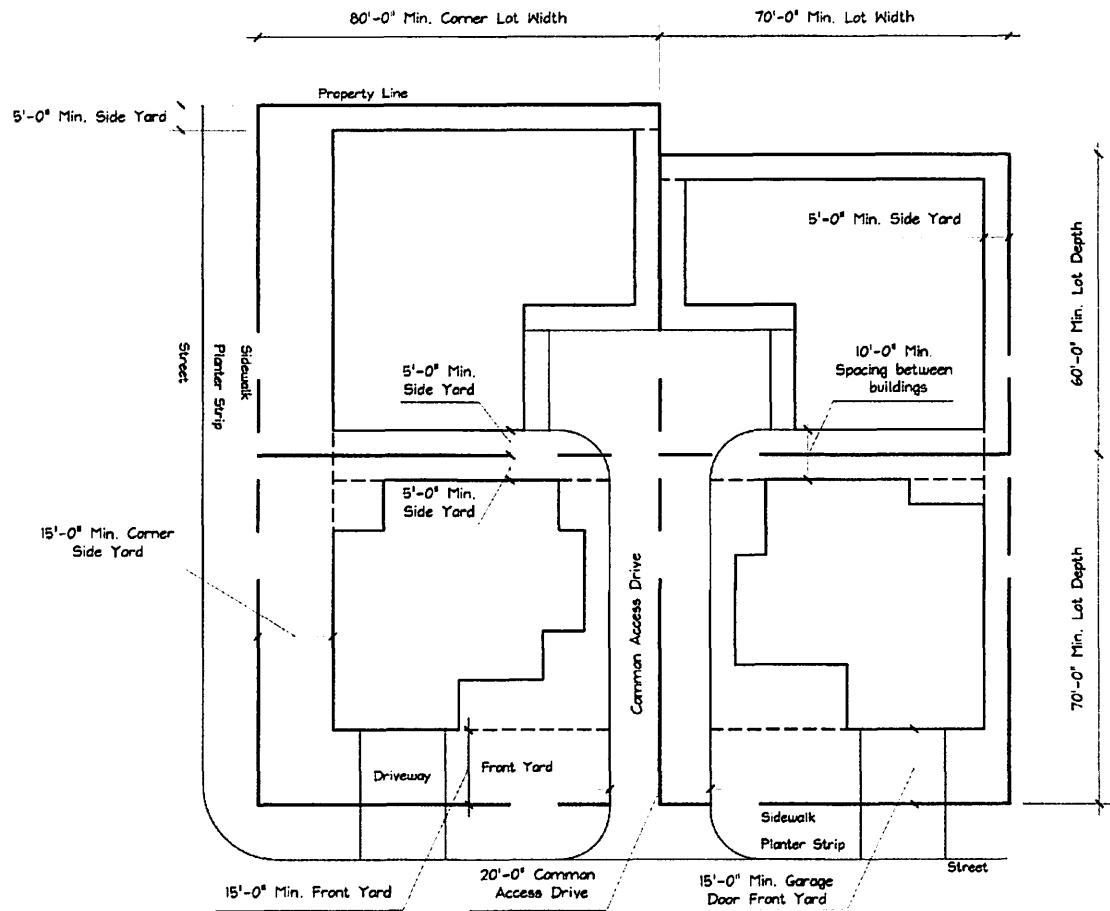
# EXHIBIT E - PD DEVELOPMENT STANDARDS - 2-4 FAMILY DWELLING AND TOWNHOME USE
